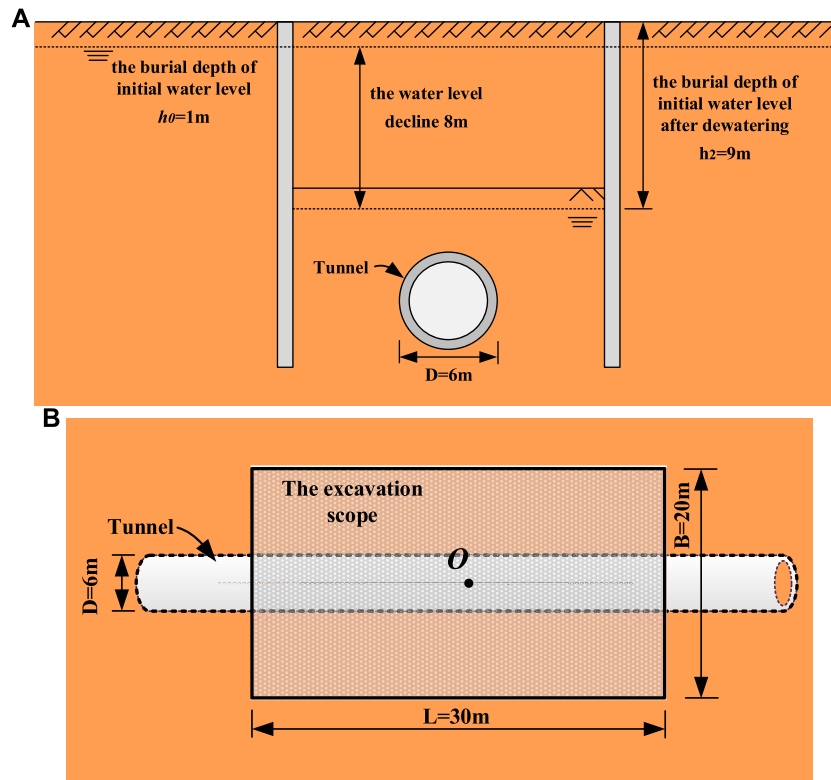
Engineering schematics: (A) sectional view; (B) plan view.
